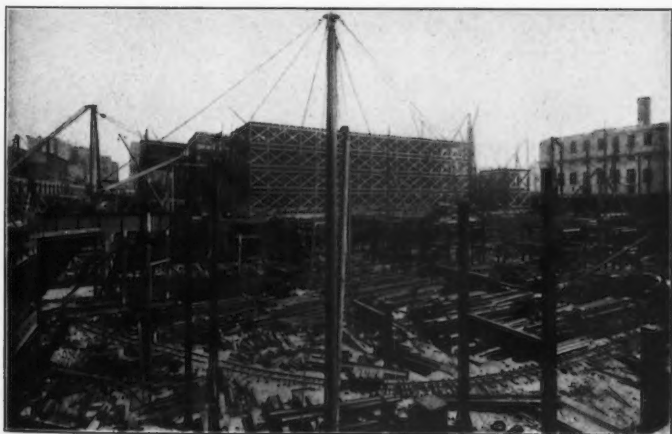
FALSEWORK FOR WAITING-ROOM ROOF, AND MASONRY DURING CONSTRUCTION.
